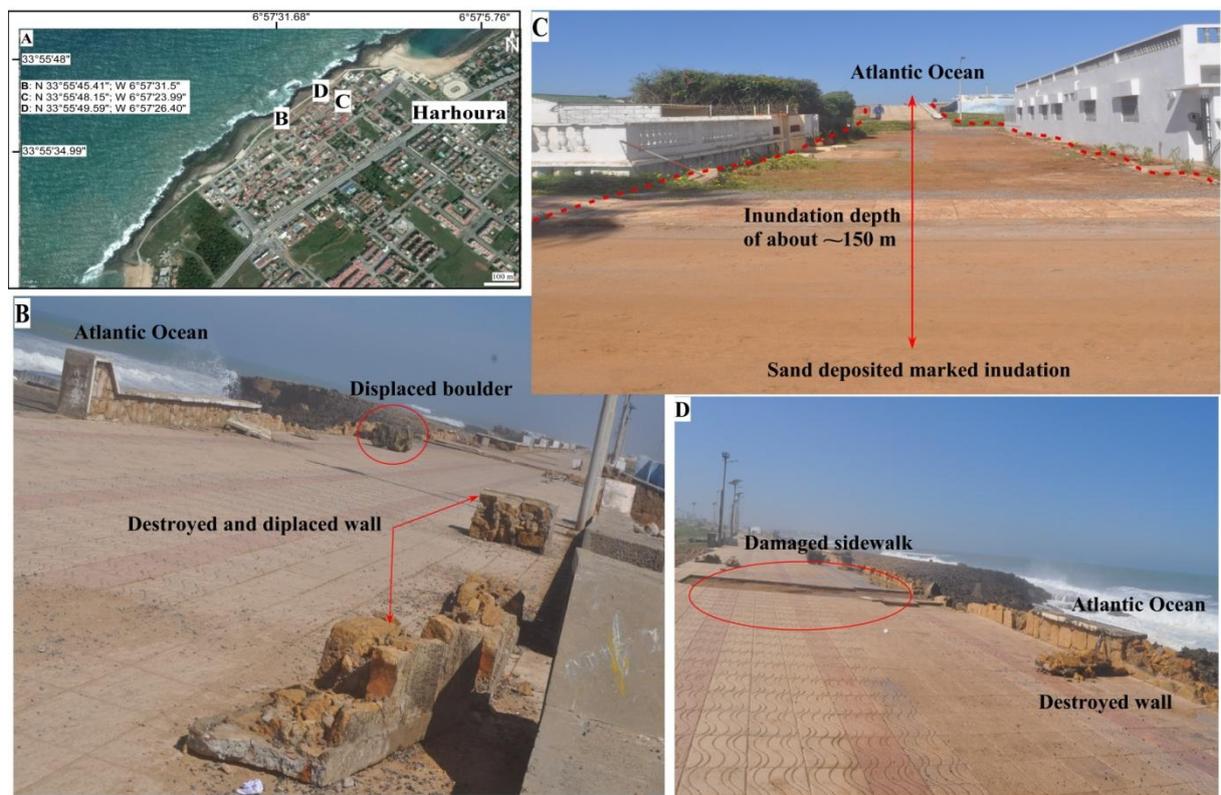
Damage caused by the storm surge on Temara. A: Location of the observation sites; B: Destroyed and displaced wall, displaced boulder (1.4 x 0.8 x 0.5 m); C: inundation marked by sand deposited (~150m); D: Sidewalk and wall destroyed.
